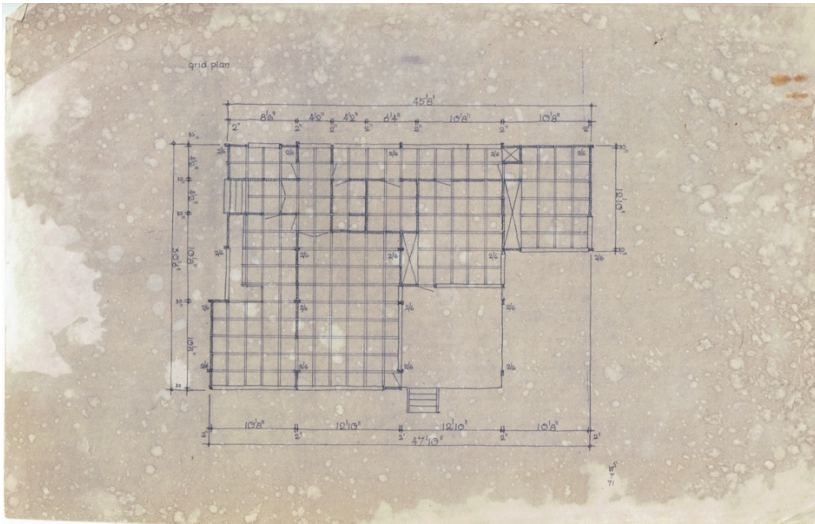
Floor Plan / Grid layout, Novem, 1971.
